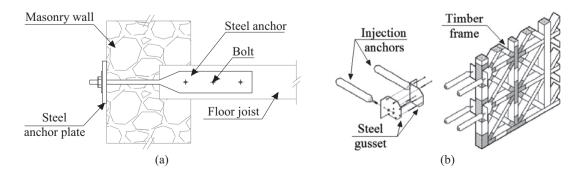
Strengthening solutions: (a) anchoring floor joists to masonry walls with steel ties with anchor plates (adapted from [14]); (b) anchoring half-timbered walls to masonry walls through injection anchors [12].
